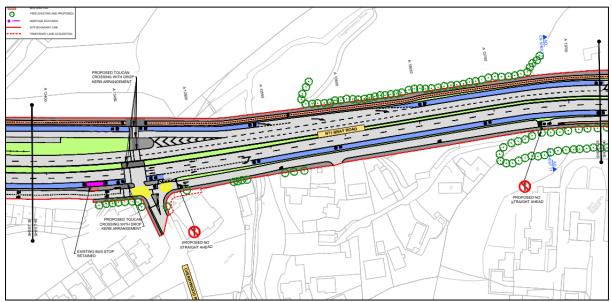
Extract from General Arrangement Drawings (Sheet 39)
